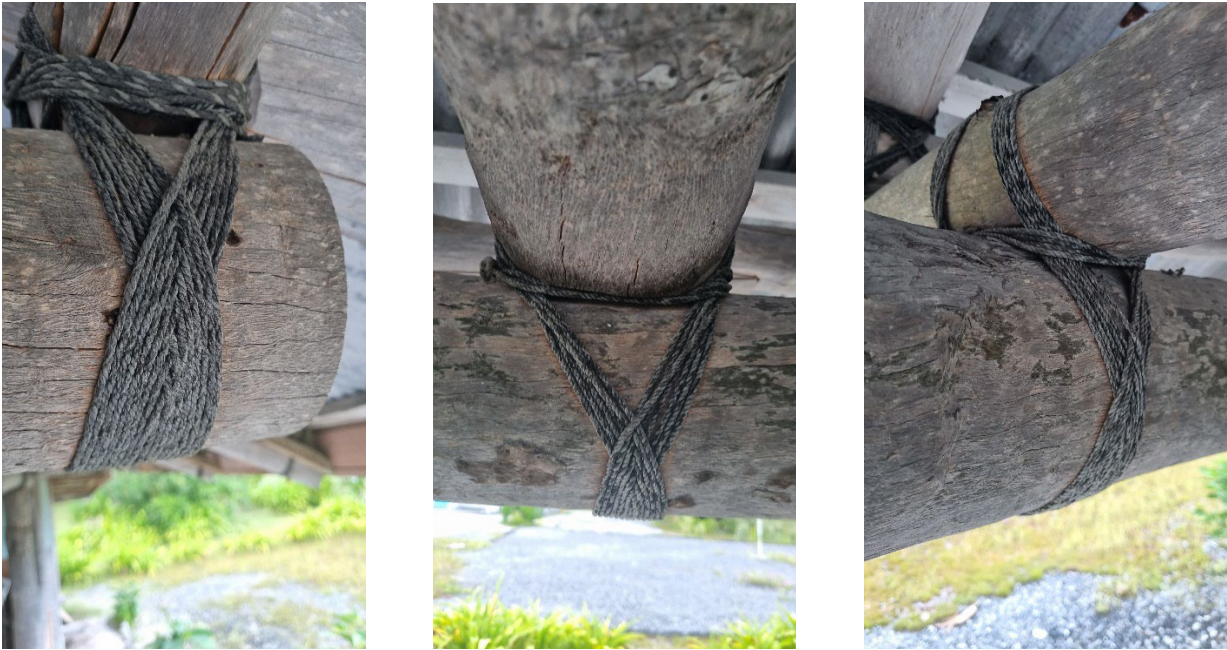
Yimu Wakawiwi lashing technique on new Nassau meeting house, 1987
